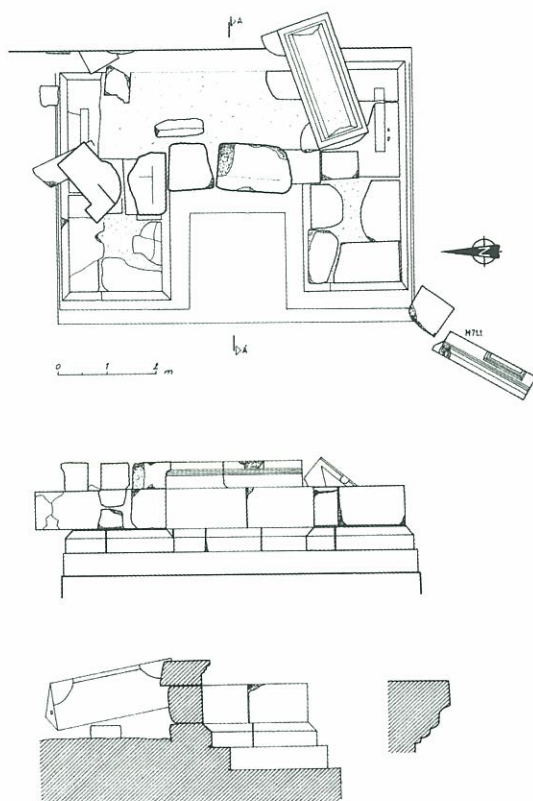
Patara, Akdam tomb with exedra M71, plan, elevation, cross-section.
